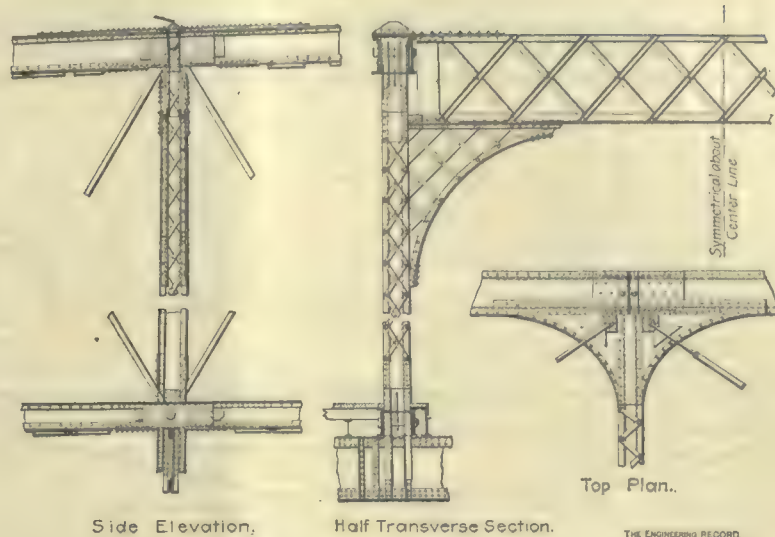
CONNECTIONS OF THE STIFFENING TRUSS.
